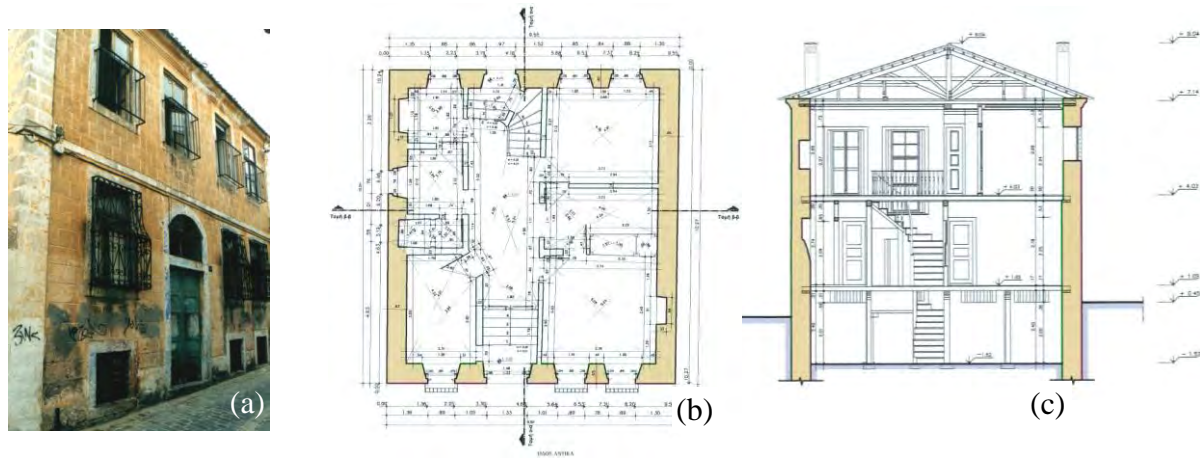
Building A: (a) eastern view, (b) plan, (c) cross section
